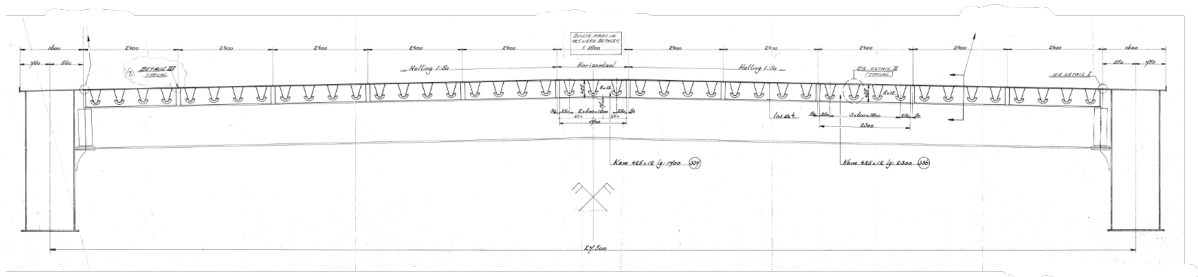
Cross-section Second Van Brienenoord bridge deck [51]
